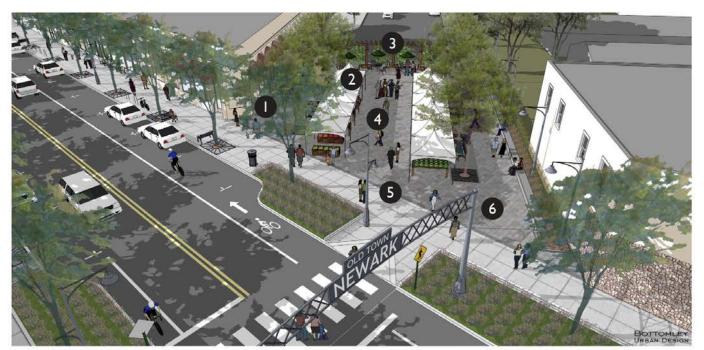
Thornton Avenue Sidewalk (Proposed)
